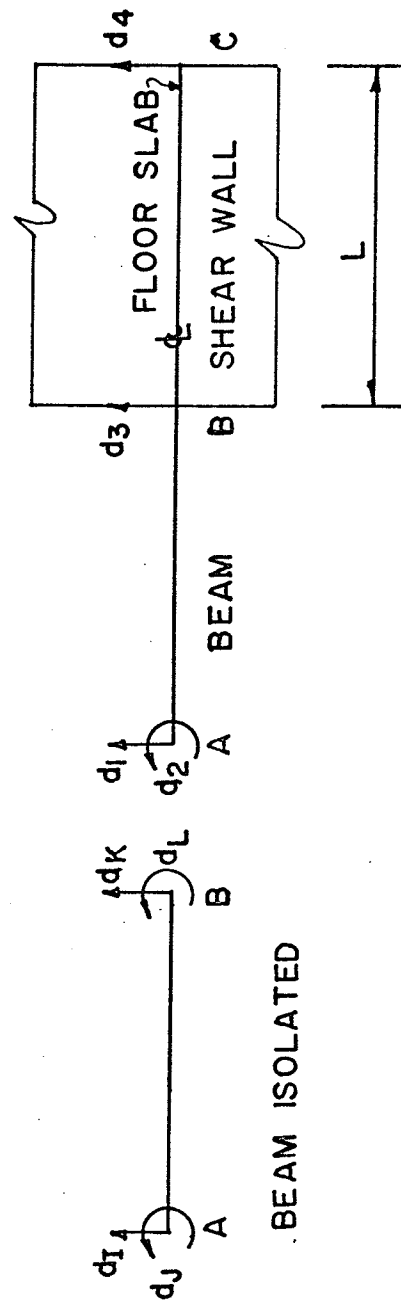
RIGHT END OF BEAM FRAMING INTO SHEAR WALL
